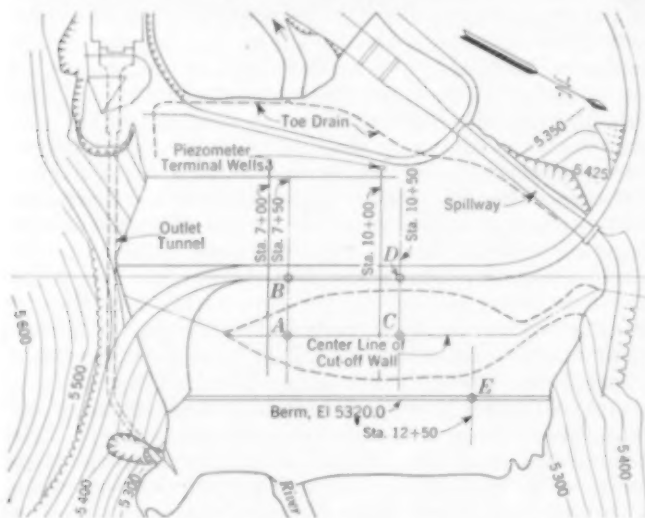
PLAN OF DAM WITH LOCATIONS OF TESTING APPARATUS
